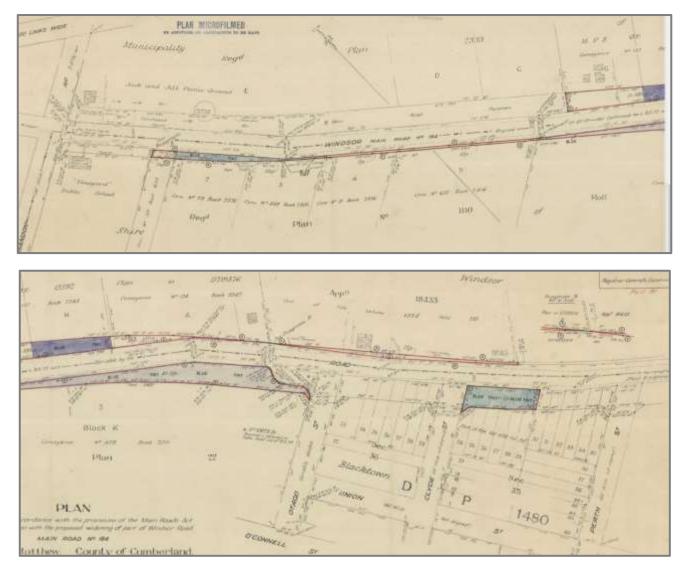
1958 plan of the proposed widening of Windsor Road between Chapman Road and Perth Street (Plan of realignment ... in connection with the proposed widening of part of Windsor Road, LPI Crown Plan 17900.3000).
